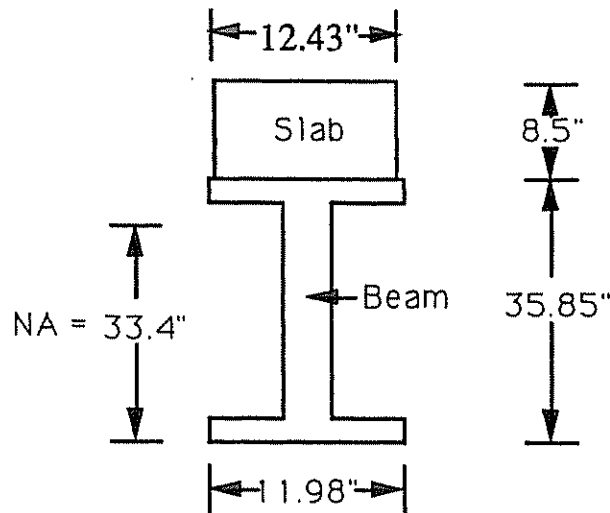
Typical Transformed Cross-Section - 8.33' Spaced Girders.
